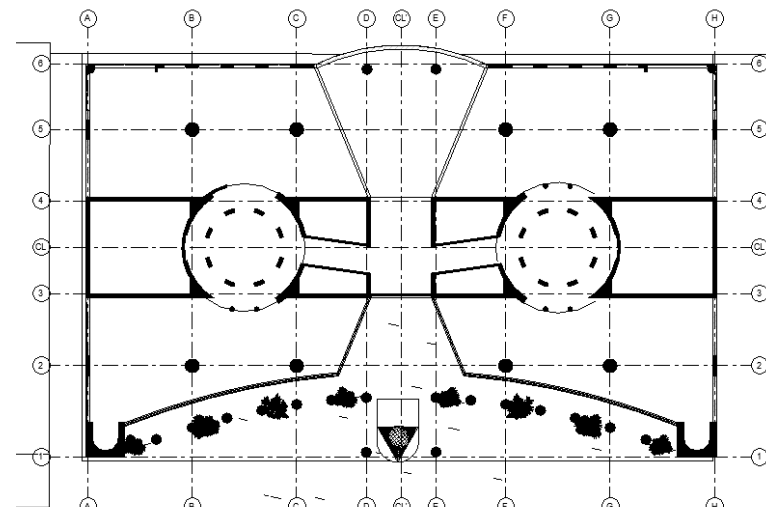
Image showing First Floor Plan of Nation Centre Building.
